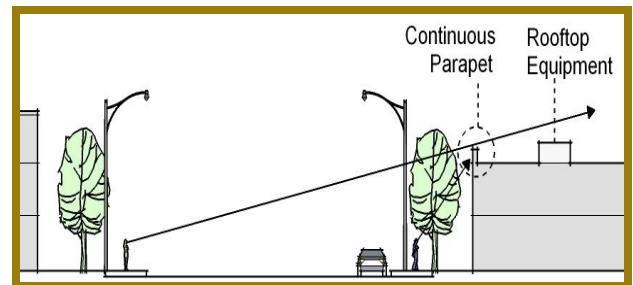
Locating this building's rooftop equipment away from the street and incorporating a continuous parapet helps block the equipment from public view. Design Criteria:
